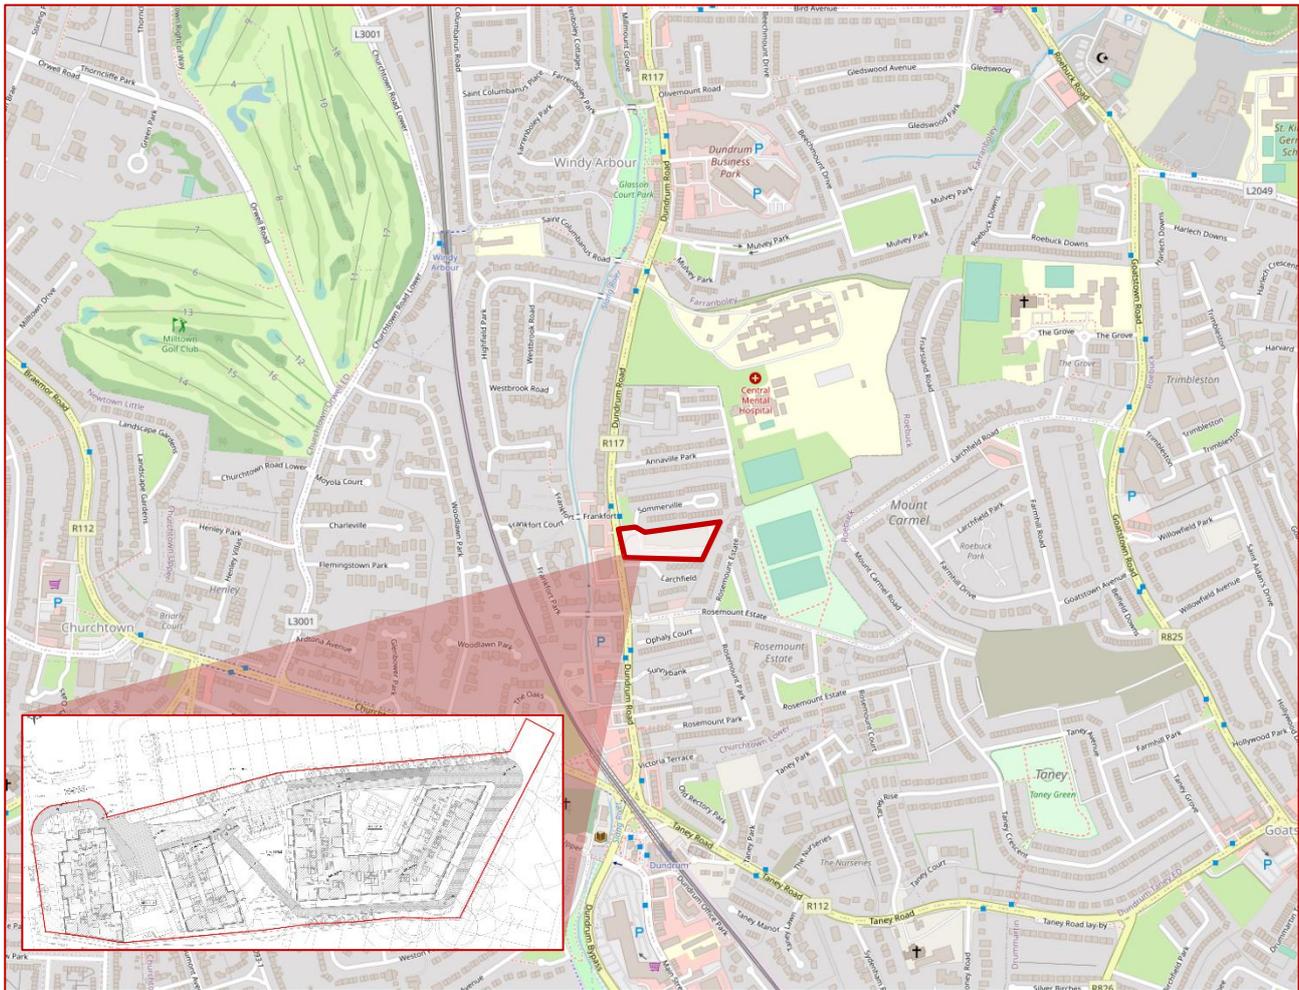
SITE LOCATION PLAN (SOURCE: WWW.OPENSTREETMAPS.ORG)
